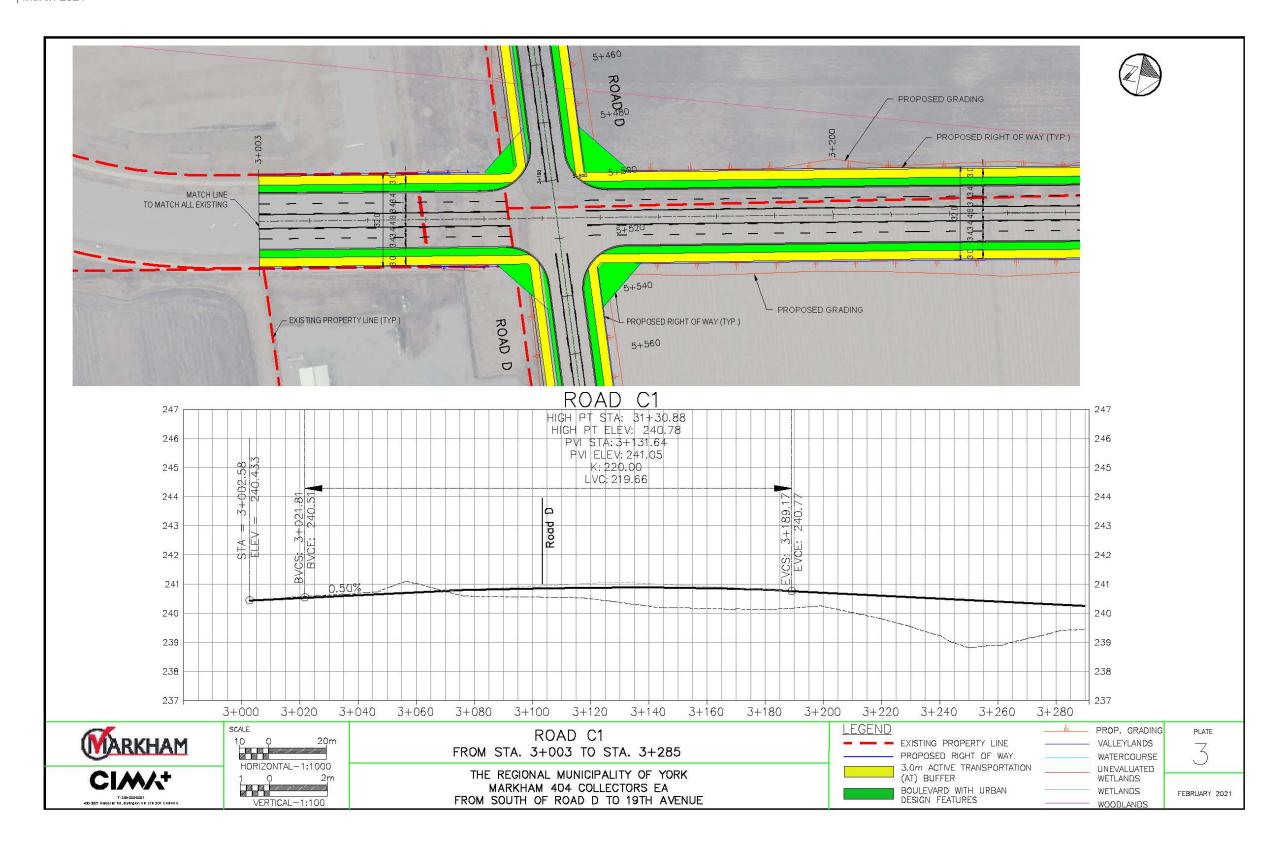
Preliminary Design Plate Road C1 Station 3+003 to Station 3+285
